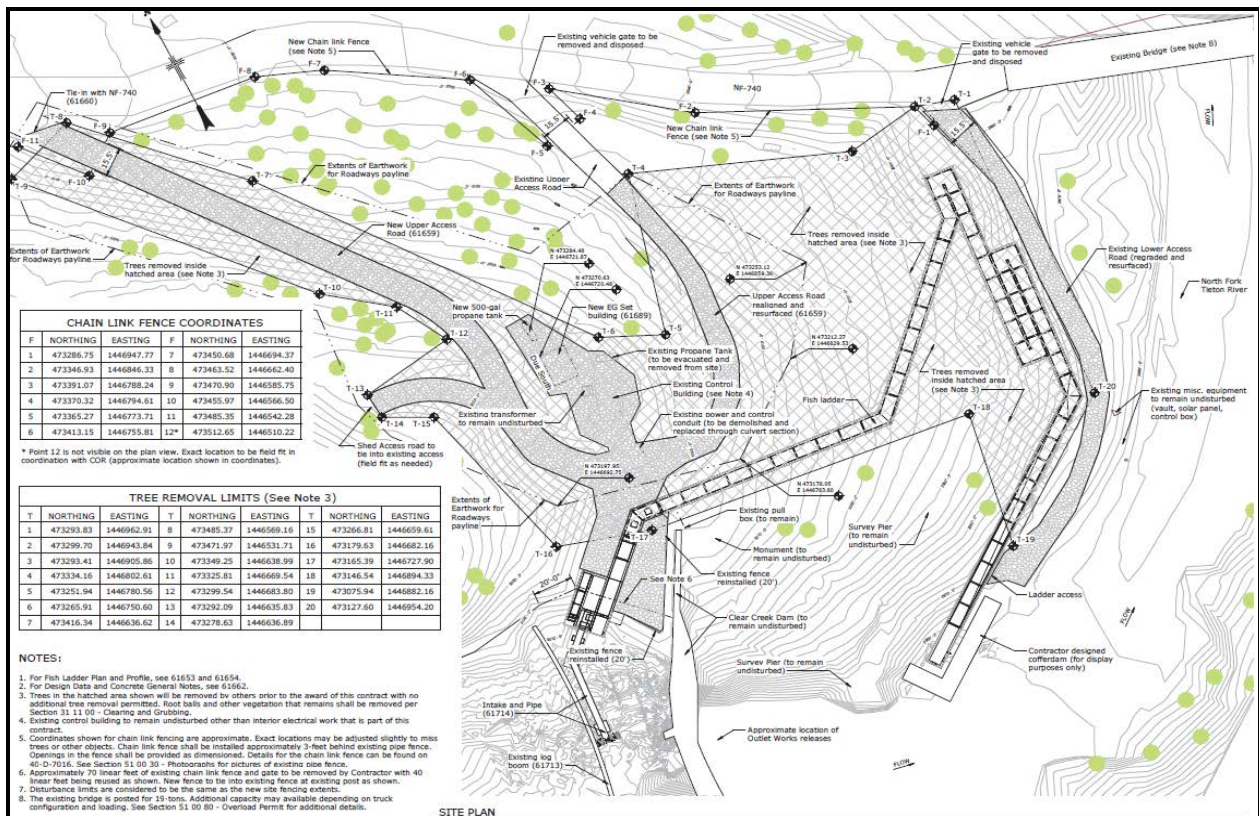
Plan view of the project area with illustration and location of the new access road, disturbed areas, and constructed fish ladder. Tree removal would occur in the highlighted area to facilitate road and fish ladder construction and to provide areas for contractor staging of equipment. Green circles are trees that would remain on-site and would be undisturbed throughout project implementation.
